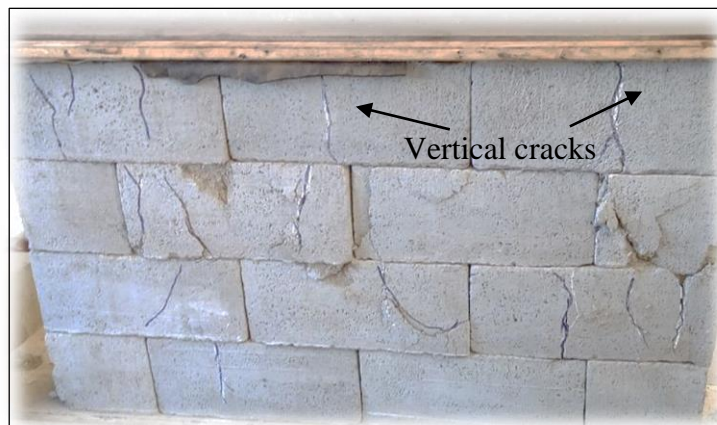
Vertical cracks parallel to the axis of loading for R-DHSBs wall model
